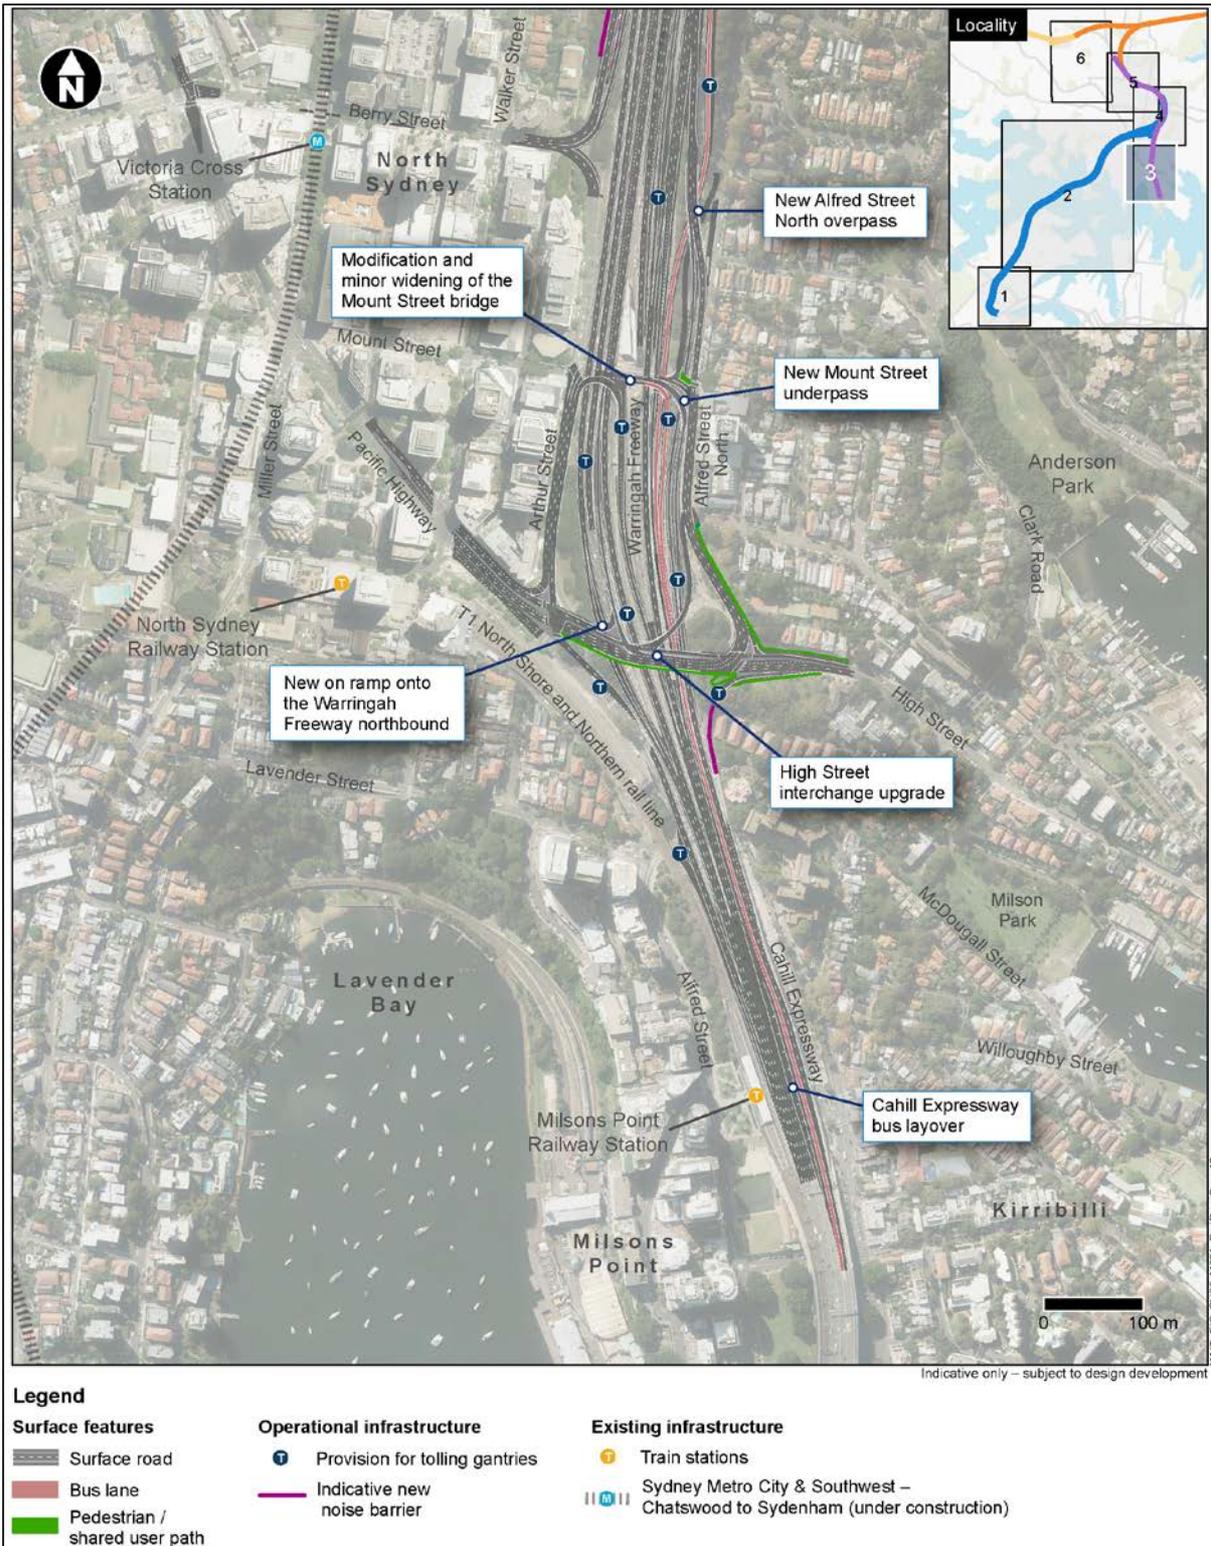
| Project Layout: Surface Road upgrades (Source: EIS)
